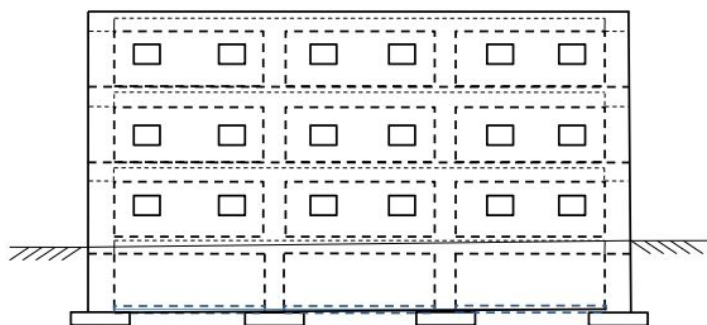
Base at foundation level where concrete shear walls extend over the full height and length of the building.
